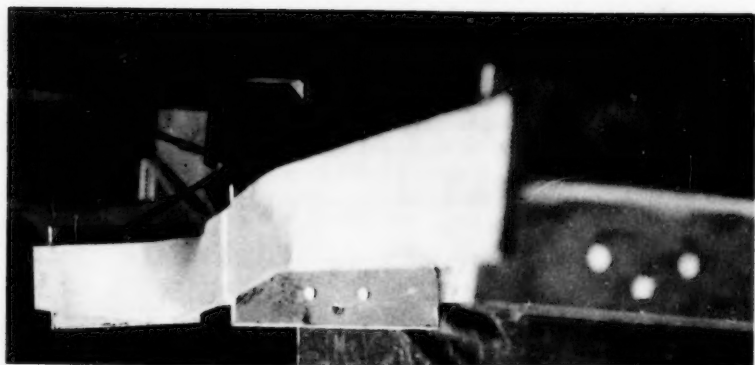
ELEVATION, BEAM 12 AFTER TEST
